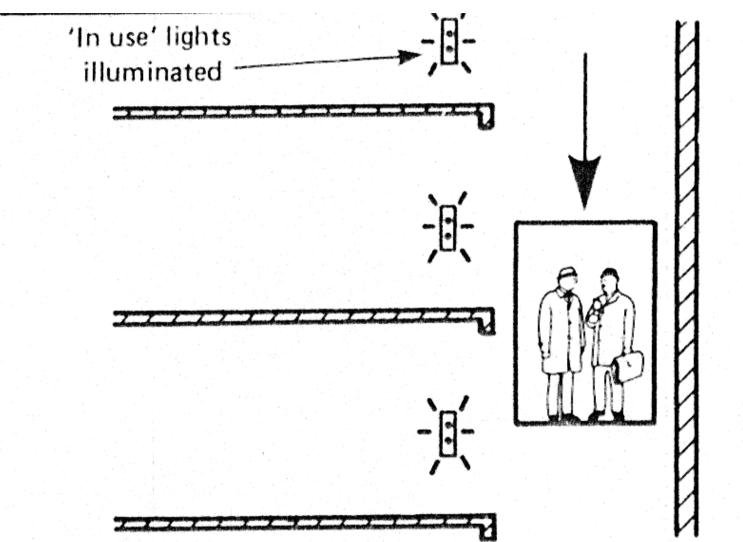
Lift car called to a floor. 'In use' lights switched on [Source: Hall, F. and Greeno, R., 2005. *Building Services Handbook*]
